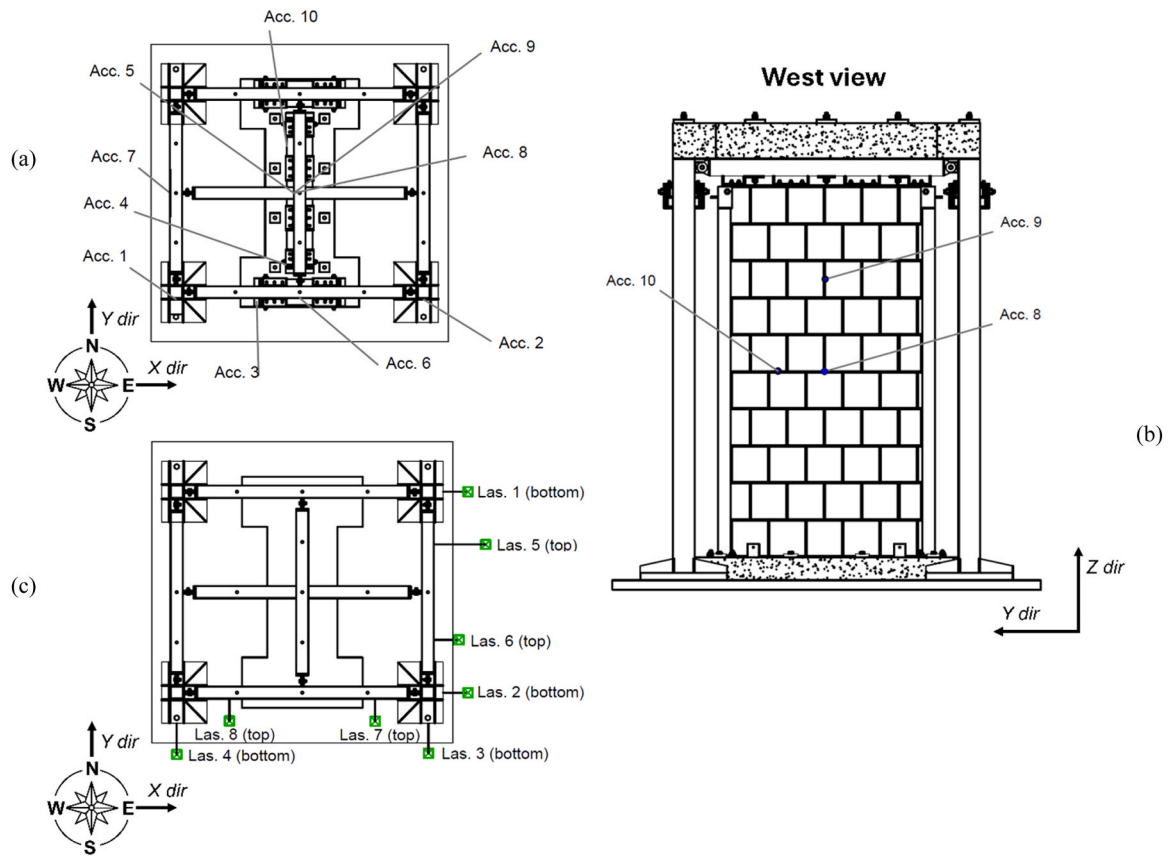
Instrumentation arrangement: (a) accelerometer position in plain view, (b) accelerometer layout in lateral view, and (c) laser-optical sensor arrangement.
